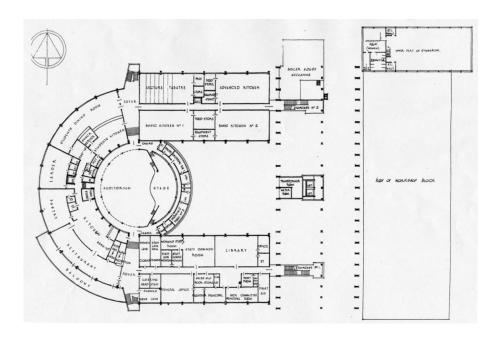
Domestic and Trades College: sketch plan of overall building
